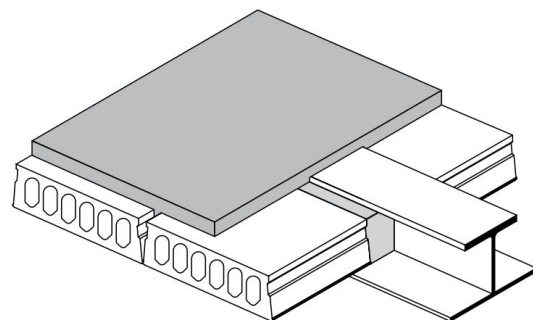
Traditional hollow core slab floor (from Bouwen met Staal, 2013).
